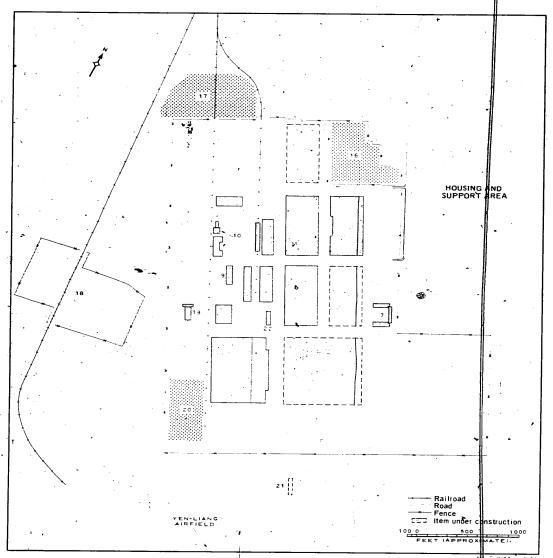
L'AYOUT OF YEN-LIANG AIRFRAME PLANT.
